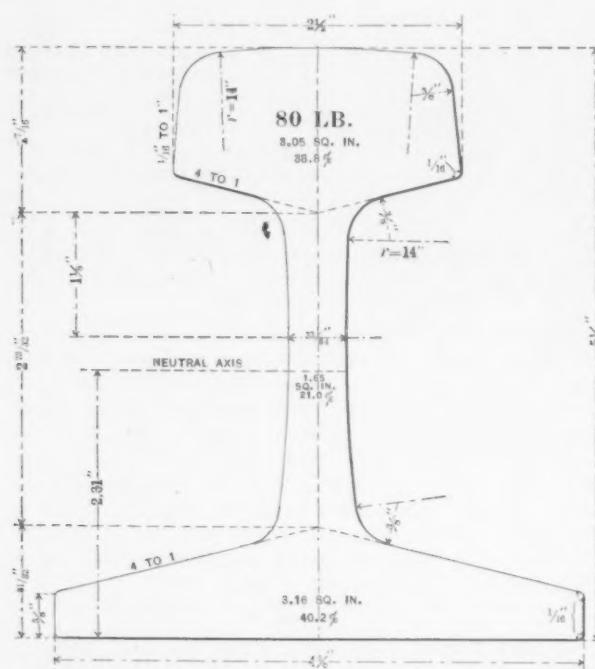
80-Lb. Rail of Series A, in Which a Stiff Girder Is Aimed at—A Modification of the Dudley Section.
